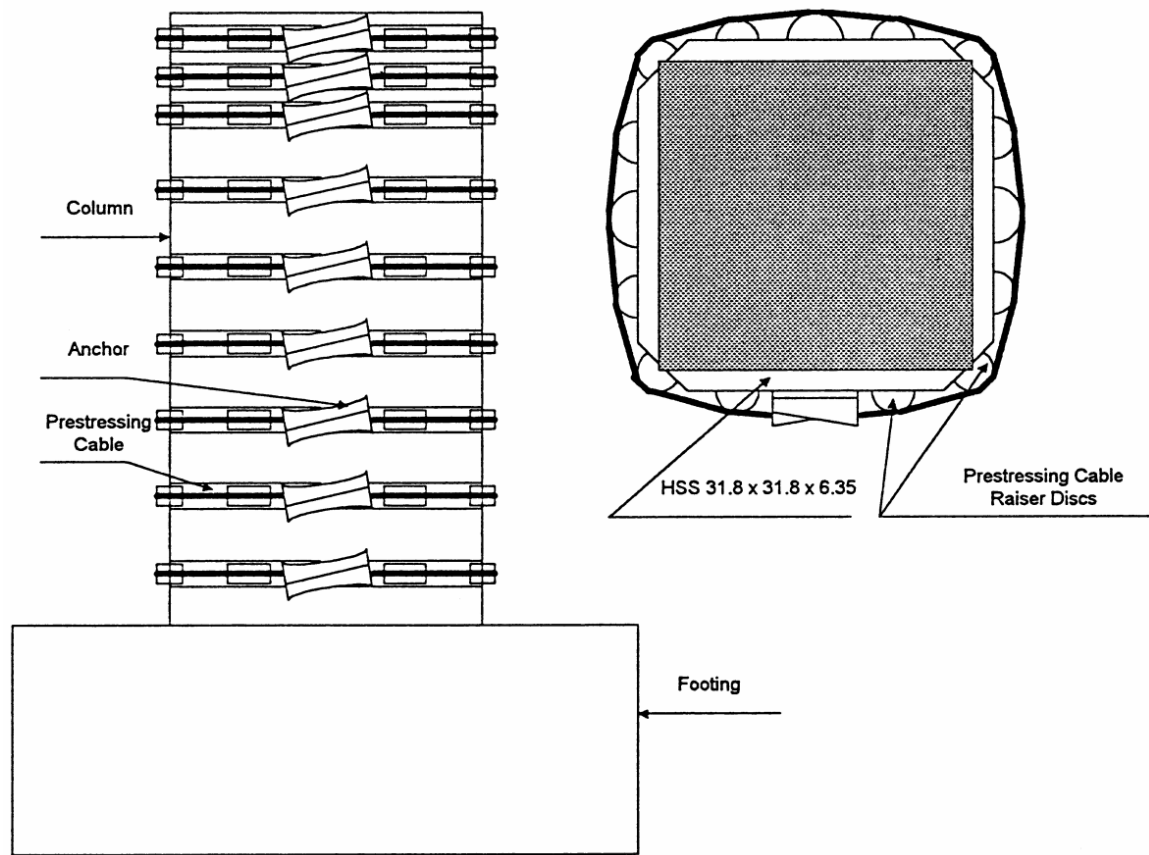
illustrates retrofitting of a square column using external prestressing by means of raiser discs. The additional hardware provided for rectilinear columns help produce near uniform pressure on faces of rectilinear columns. The hardware consists of hollow structural sections (HSS) used as external hoops, with raiser disks of different diameter welded on them to distribute the prestressing force uniformly on four faces of the column. The strands are placed directly on the raiser discs to develop perpendicular force components. The heights and locations of the raisers are calculated so that approximately equal force components are generated at the raisers.
